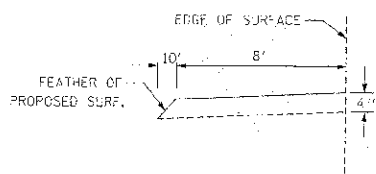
DETAIL OF INTERSECTION RT. AND LT. STA. 253+90
